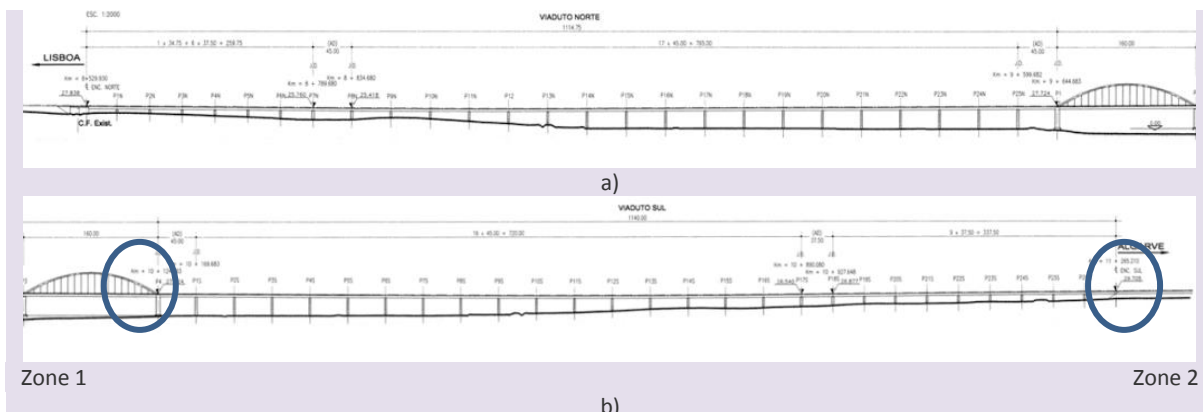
BRIDGE ACCESS VIADUCTS: A) NORTH AND B) SOUTH AND MONITORING ZONES.
